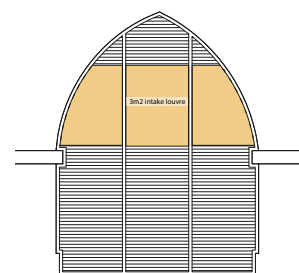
Elevation: Designated louvre zone for a typical A3 shopfront, with support provided by cross arches [right]
